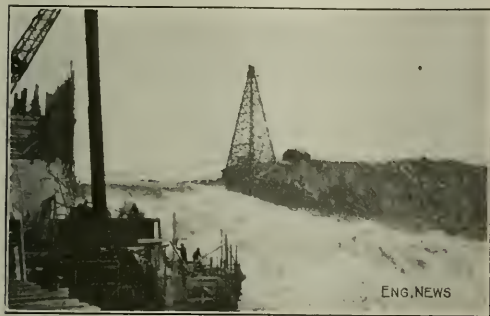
SPRING FLOOD GOING OVER COMPLETED LOWER SECTION OF POWER HOUSE, MAY 27, 1914
